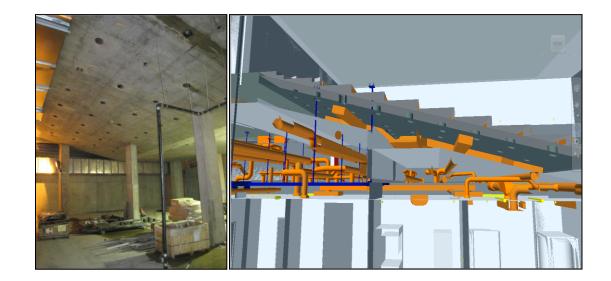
Opening in the lecture hall slab Site photo (left); 3D view (right)
